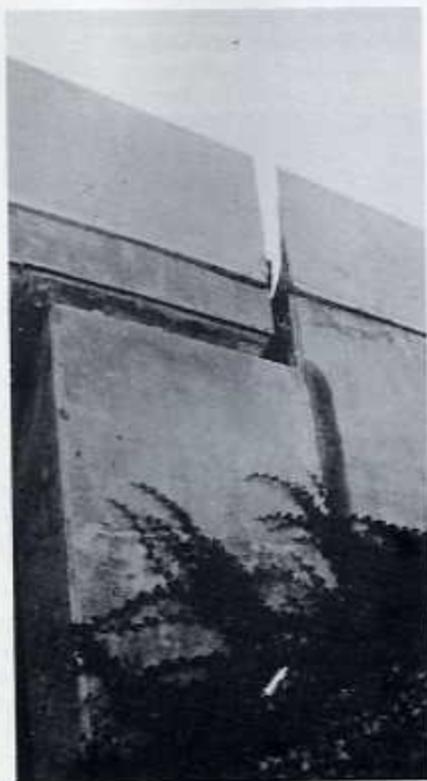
Expansion joint on the Highway 92/101 cloverleaf. The two sections of concrete are separated by styrofoam to allow them to readjust during severe ground shaking. Separation at this particular joint appeared to be on the order of several inches.
